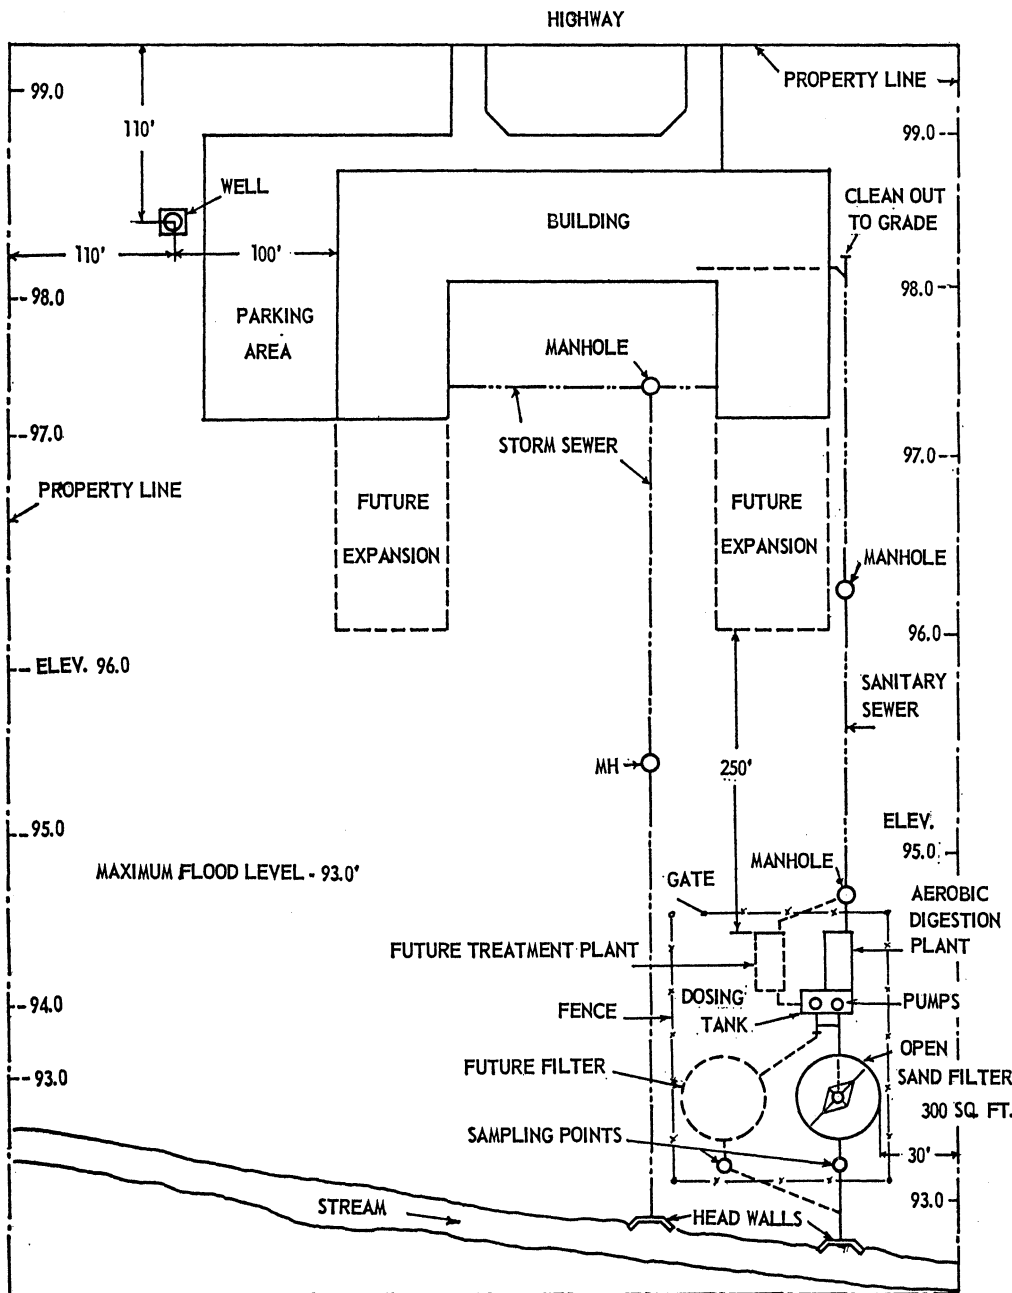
LAYOUT OF A WATER WELL AND SMALL SEWAGE TREATMENT FACILITY
